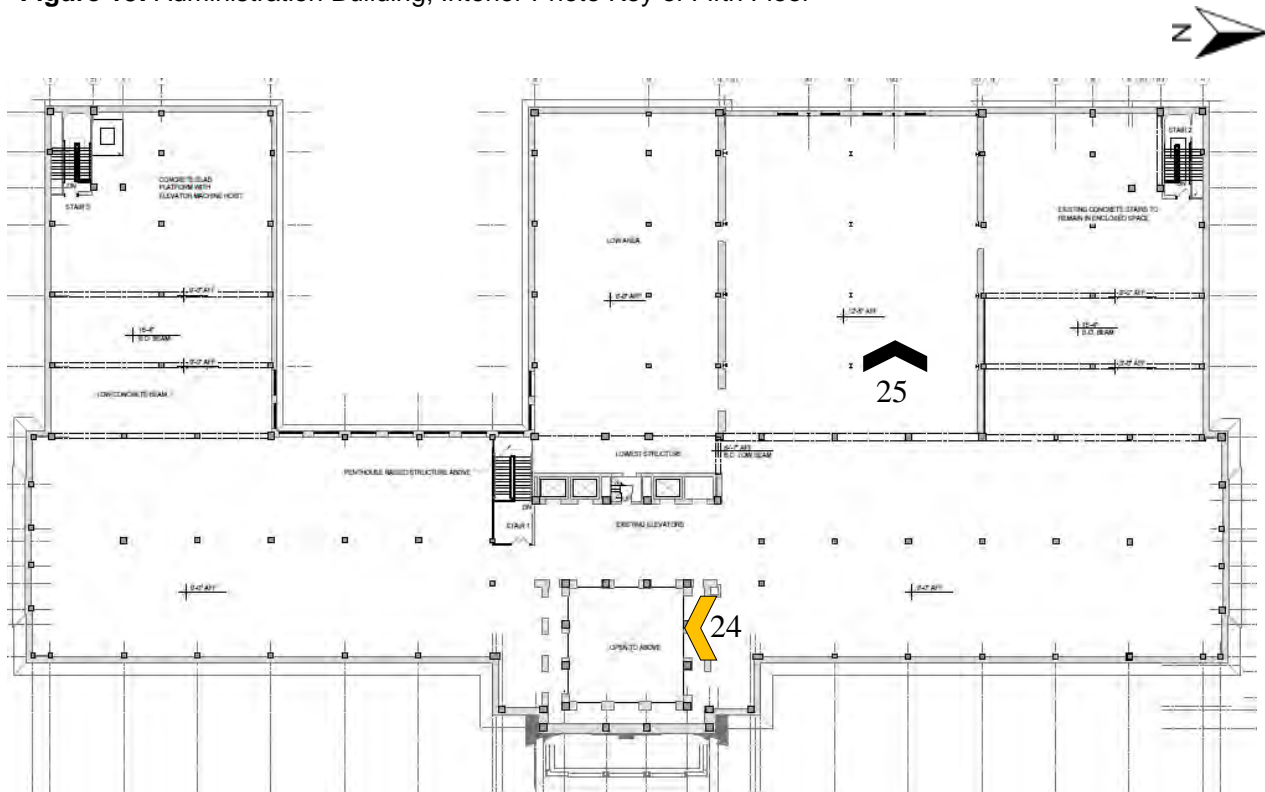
Administration Building, Interior Photo Key of Fifth Floor
